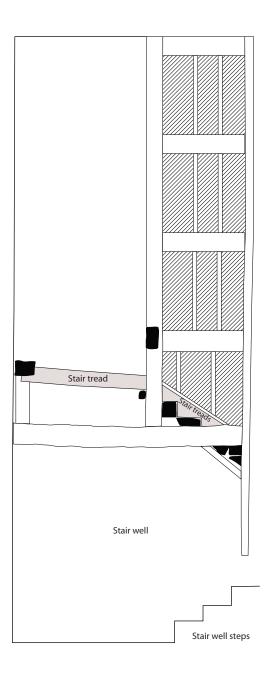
Elevation drawing of stair well showing timber framing and wattle and daub walls, from the northwest. Scale 1:40 at A4.
